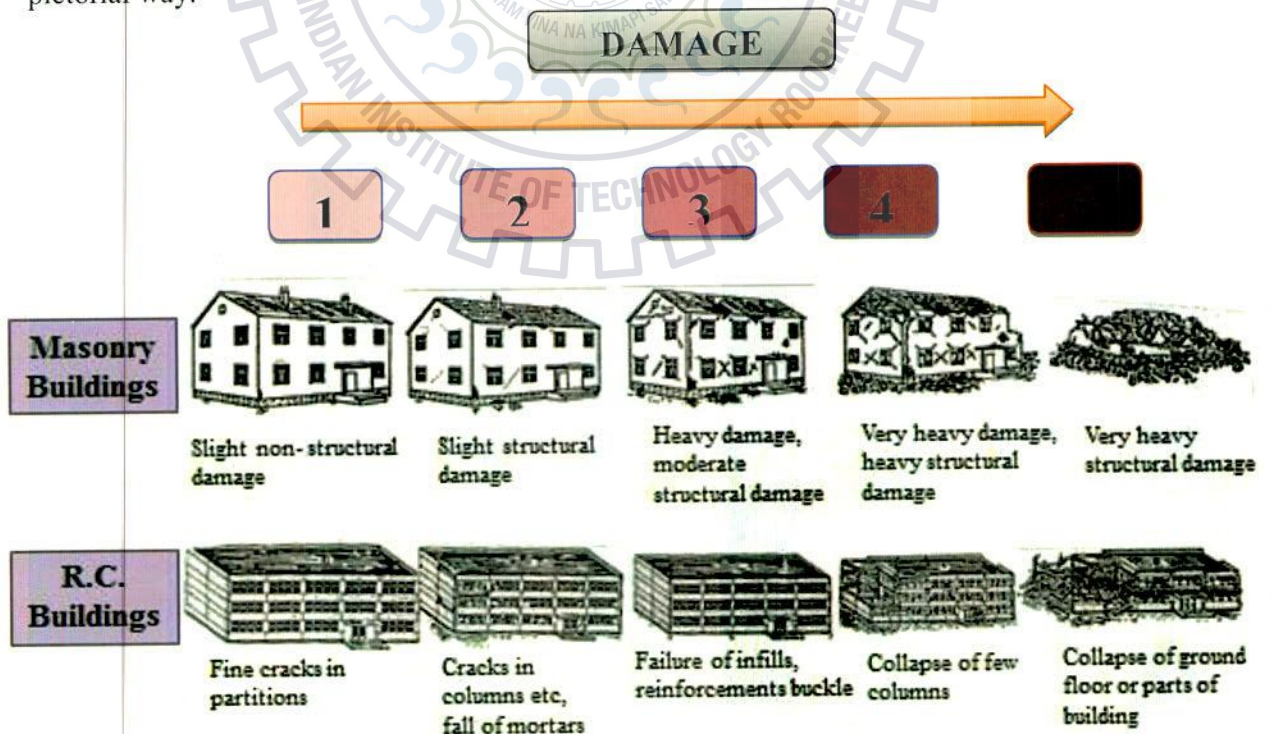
Behaviour of RC Buildings and Masonry Buildings under various Damage Grades
